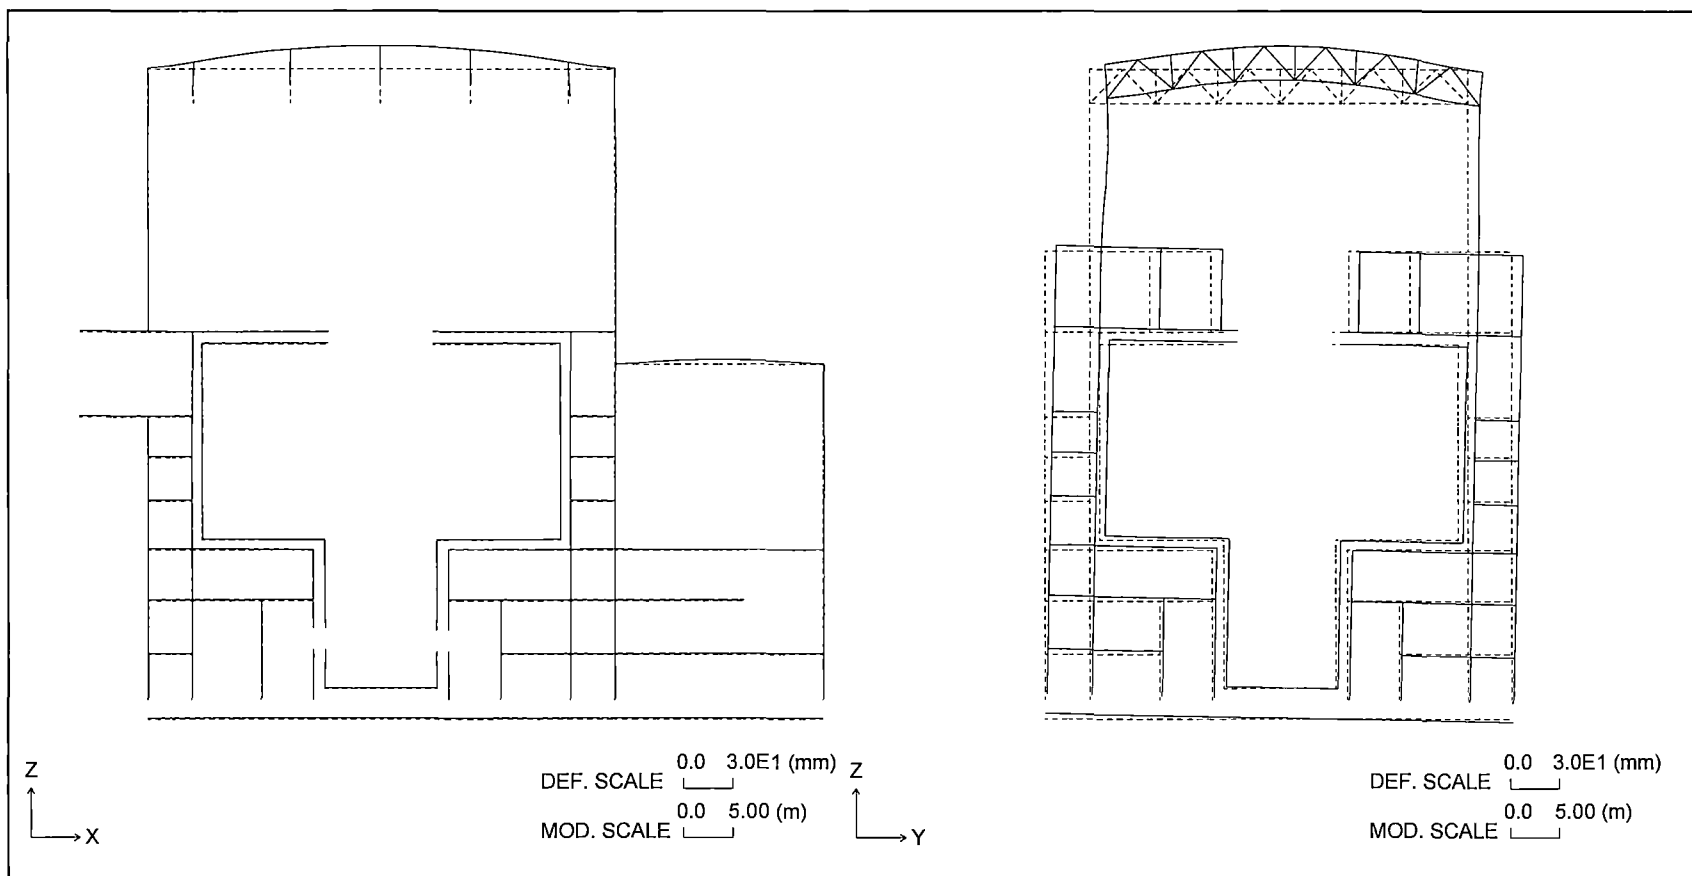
Section Deformation for Tornado Load (West Wind)
